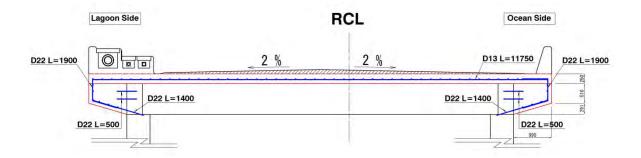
Typical Cross Section of Bridge Widening
